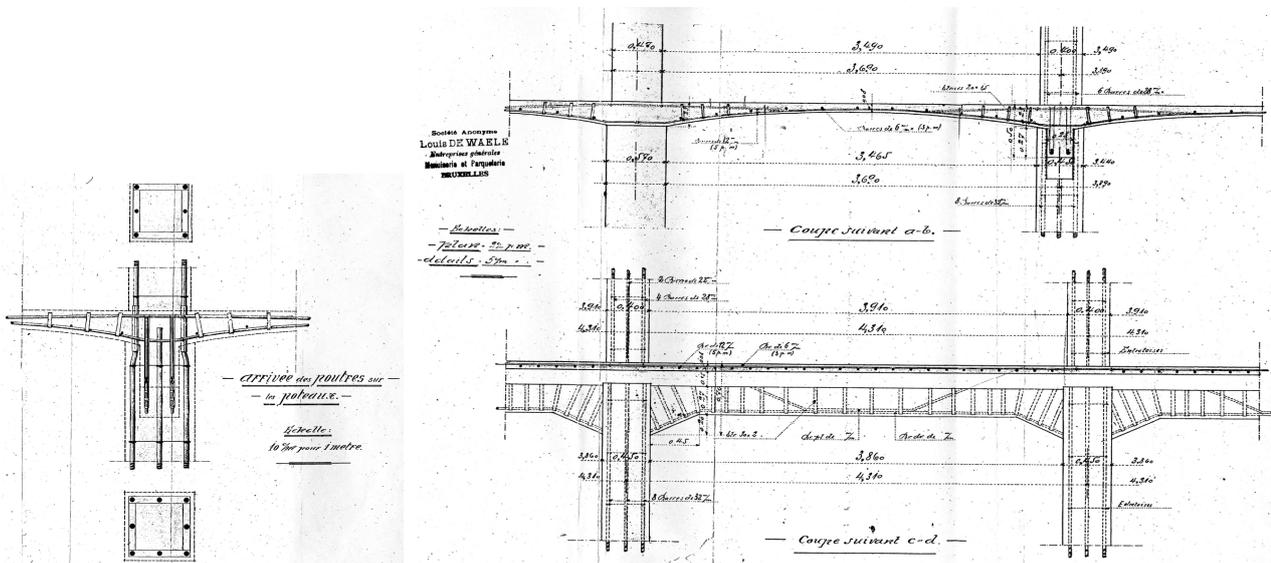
Warehouse Tour&Taxis. Construction details of the reinforcement by François Hennebique: column (left) and arched floors (right) (Archives n.v. Zeekanaal en Haveninrichting)
